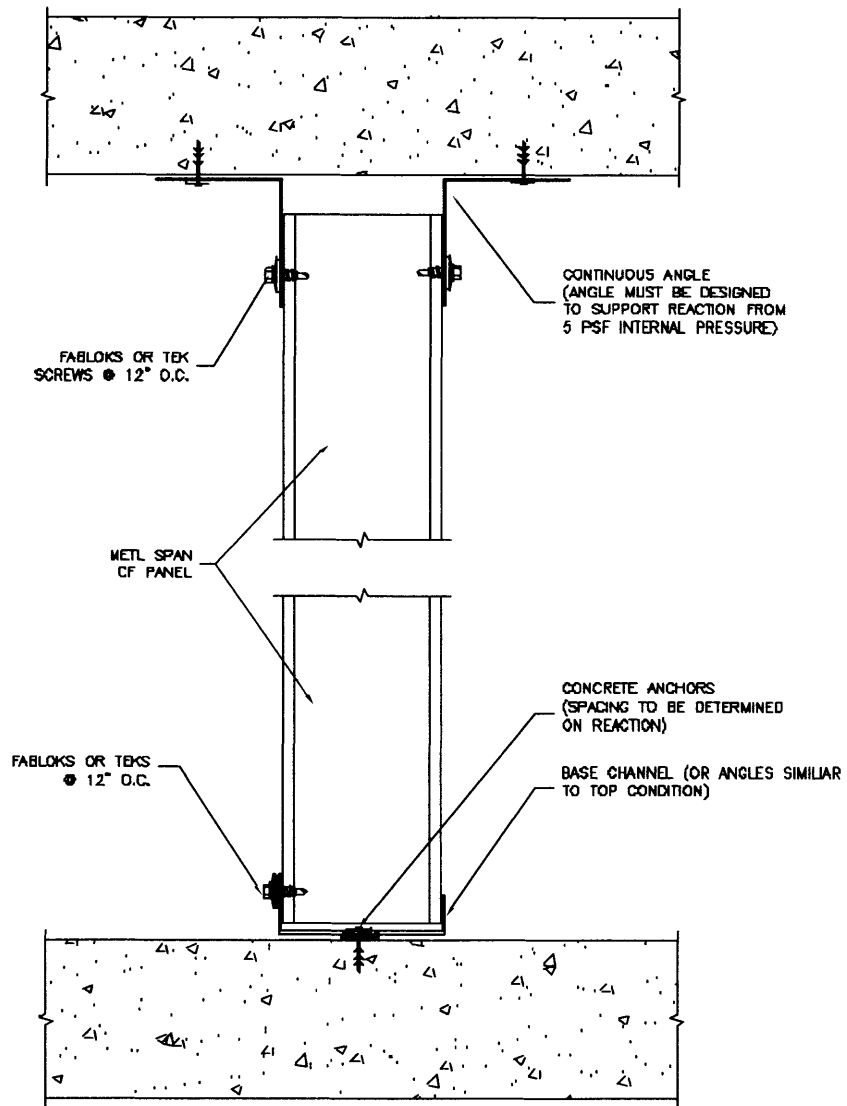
TYPICAL PANEL END CONNECTION DETAILS
